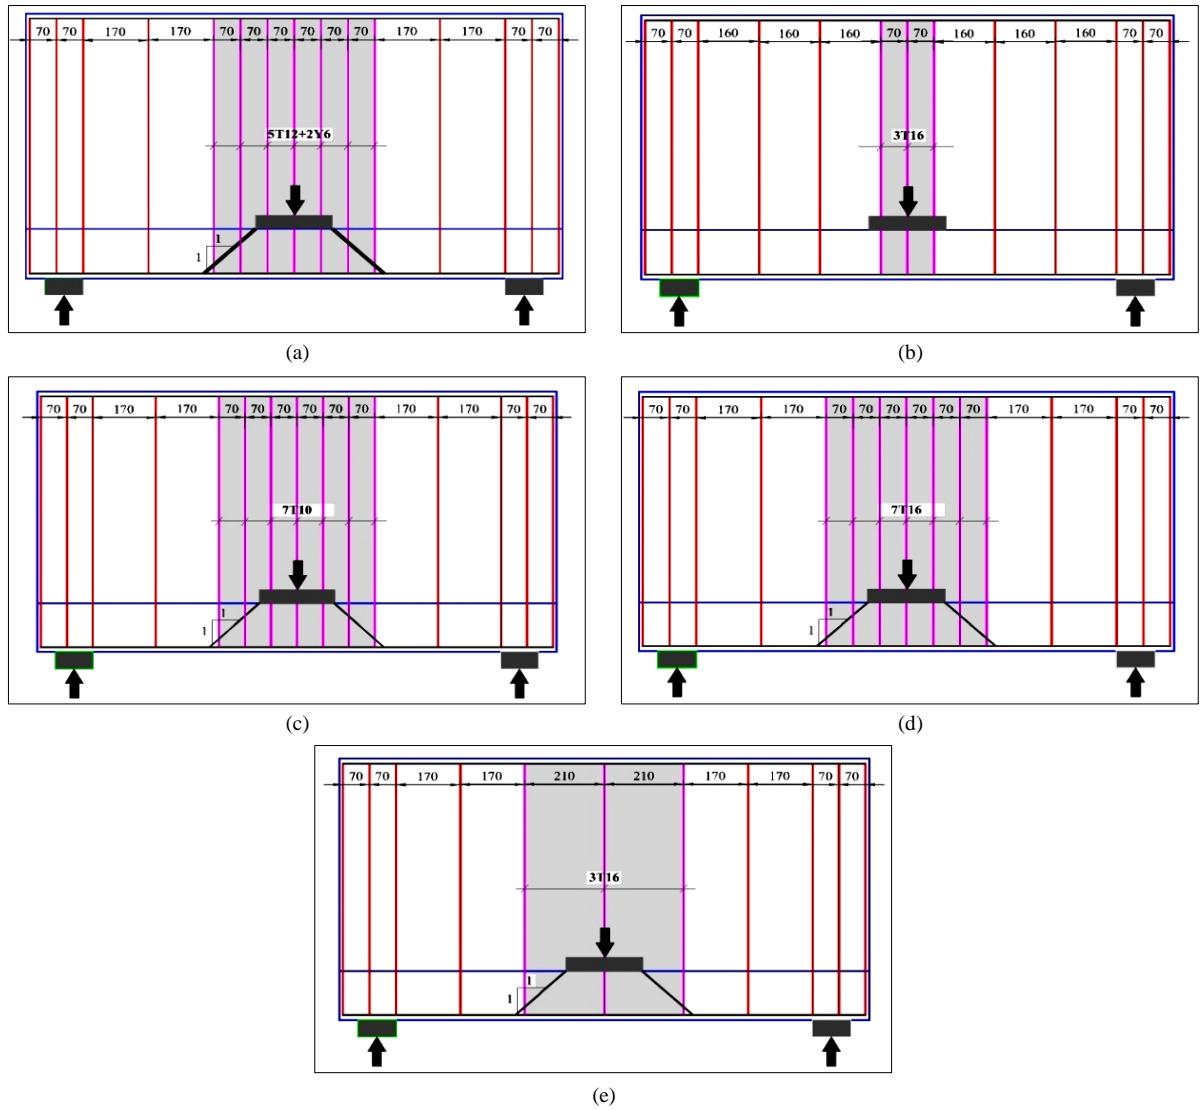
Reinforcement details for specimens with variable hanger reinforcement
